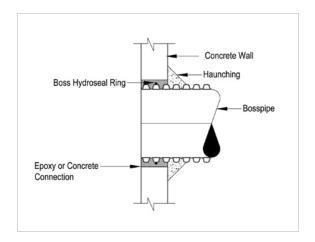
Manhole Connection with a Boss Hydroseal ring Where physical anchoring of the pipe is required (ie. like a puddle flange) – suitable for cesspits, stormwater manholes, concrete walls, etc.
